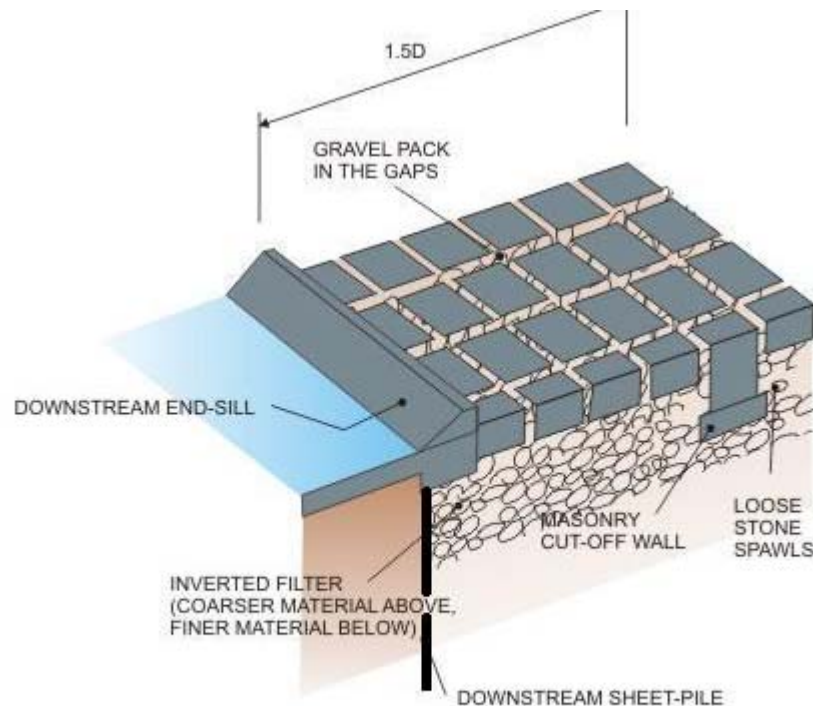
DOWNSTREAM BOLCK PROTECTION
